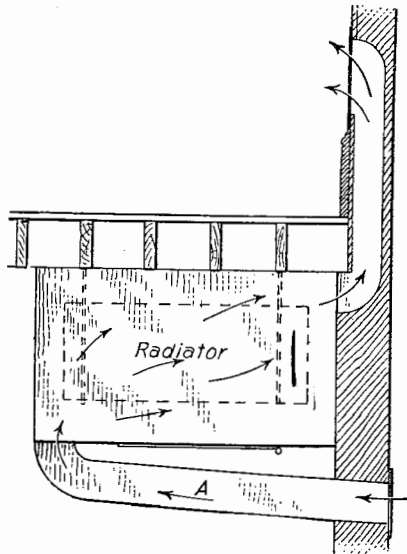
Method of Indirect Warming by Enclosing Radiator in Sheet Metal Casing, Cold Air Duct Entering at Bottom
